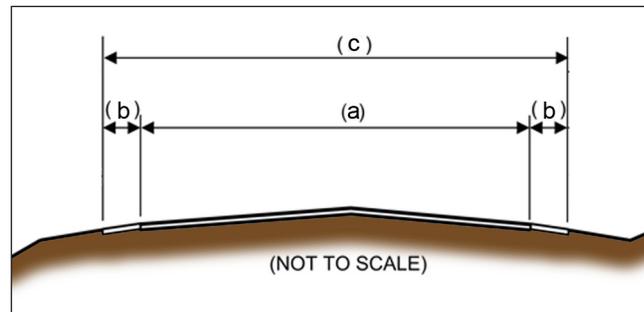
Cross-Section Profile -- Residential Mixed-Use Collector with Reinforced Shoulder
